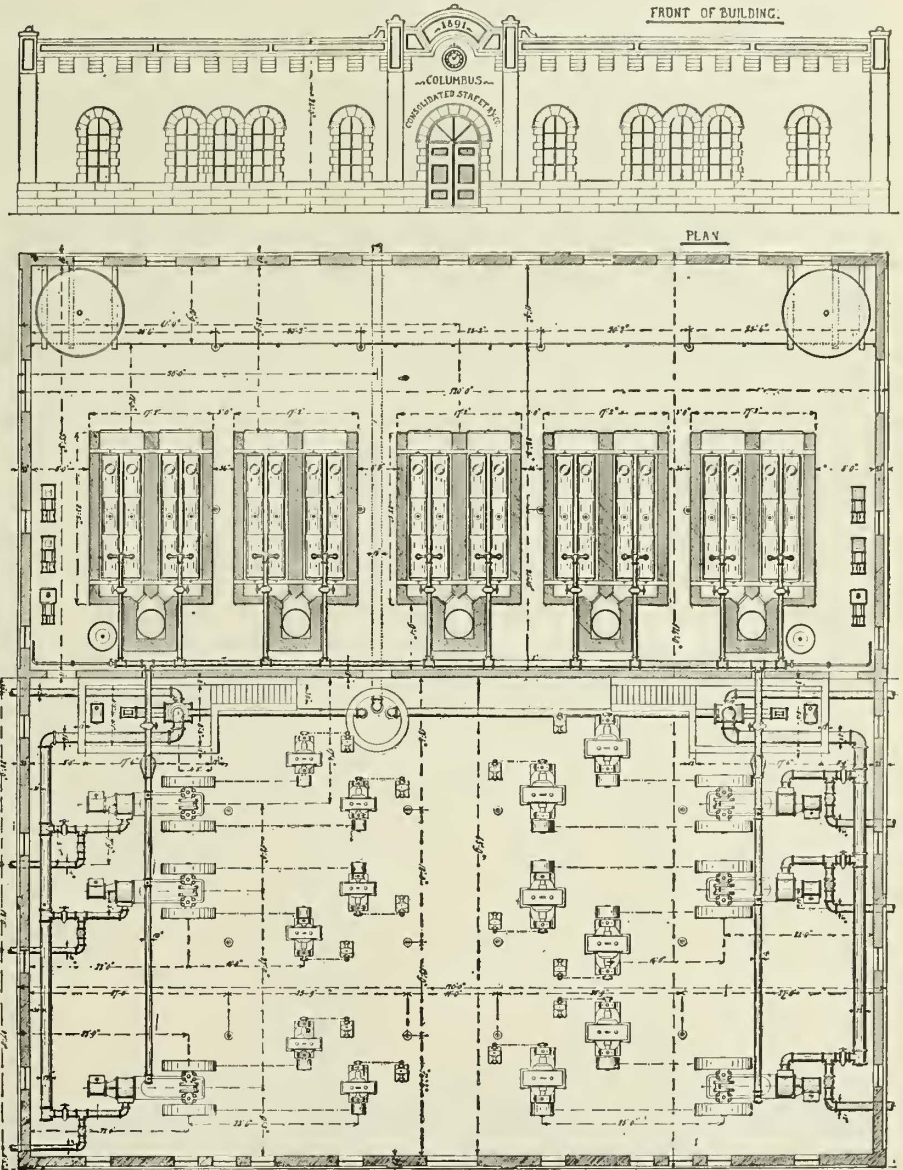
ORIGINAL PLANS FOR COLUMBUS, O., CONSOLIDATED STREET RAILWAY POWER STATION.
